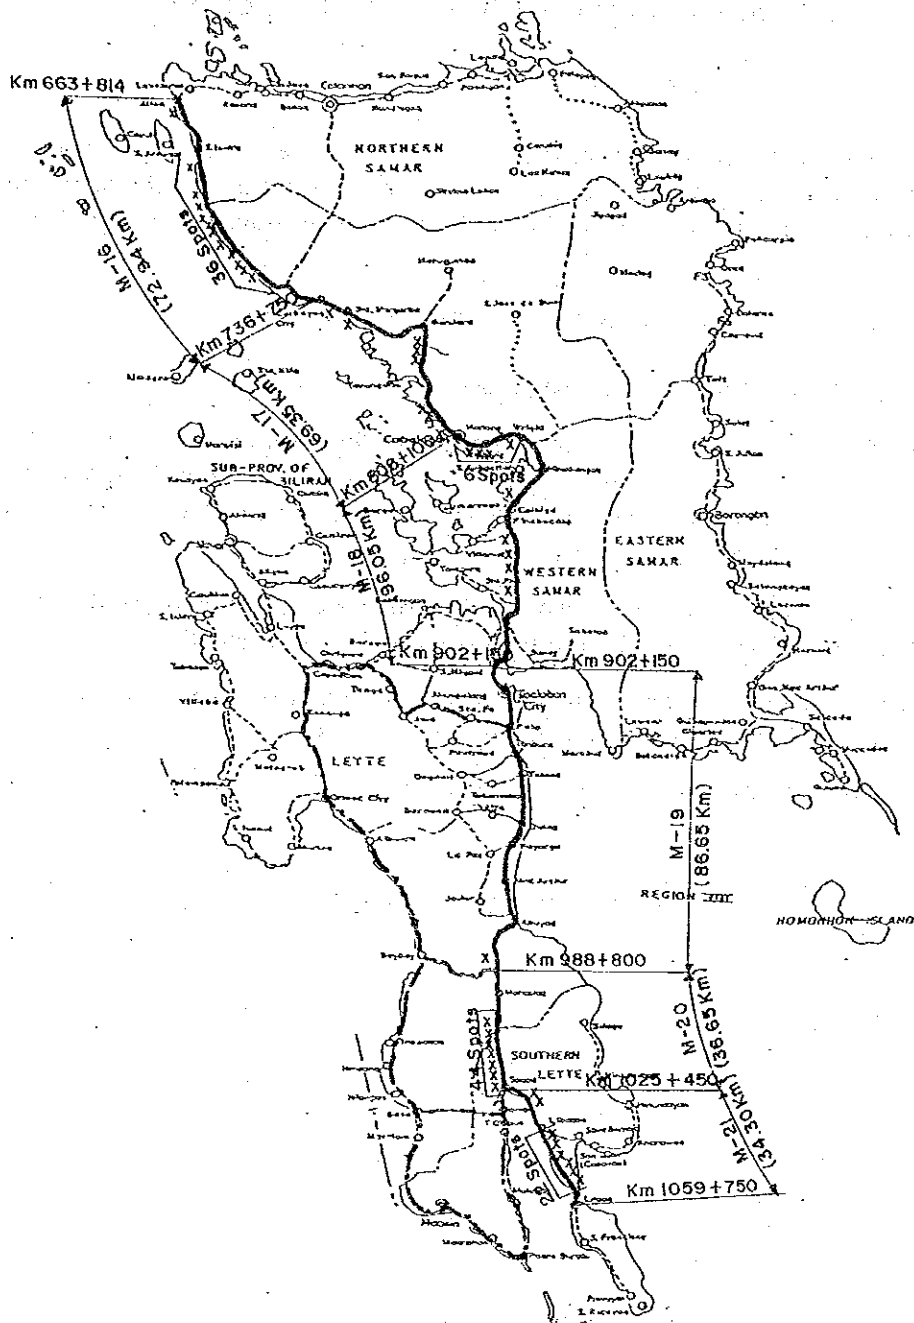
(3) ROAD SECTIONS (SAMAR AND LEYTE)
